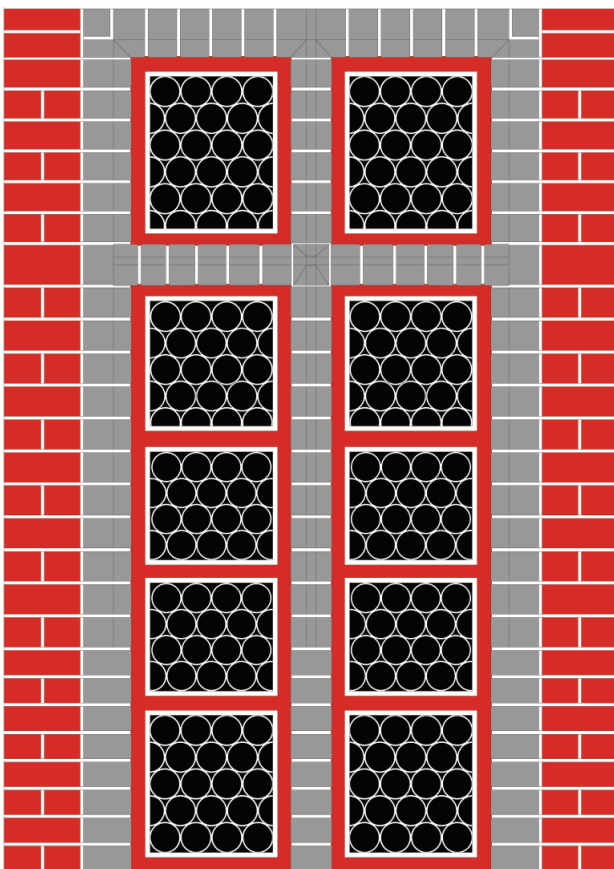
Reconstruction of the colors of a fragment of the upper floor with blank on the west elevation of the first Late-Gothic building of the town hall (by A. Legendziewicz)
